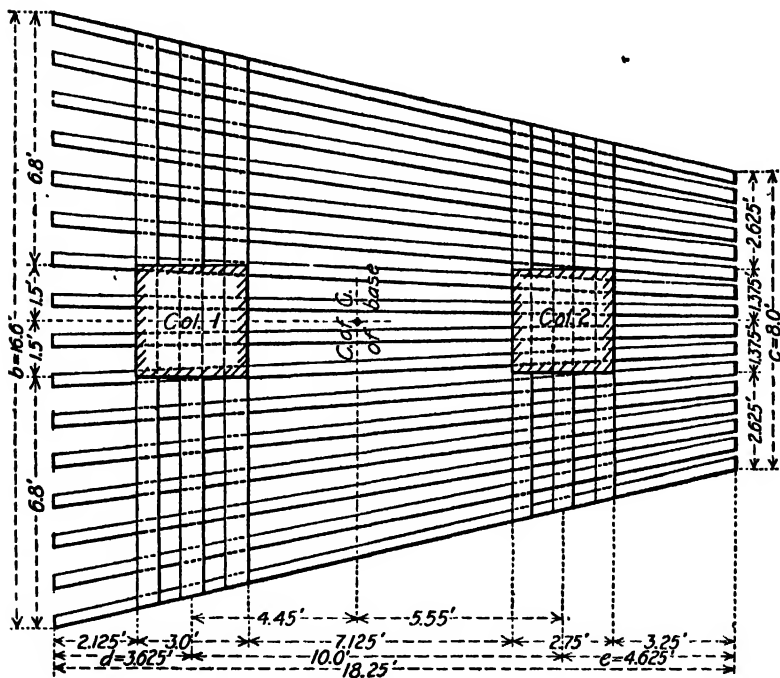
Steel I-Beam Grillage for Two Columns Supporting Unequal Loads. The load on column 1 is 500,000 pounds; that on column 2 is 400,000 pounds.
